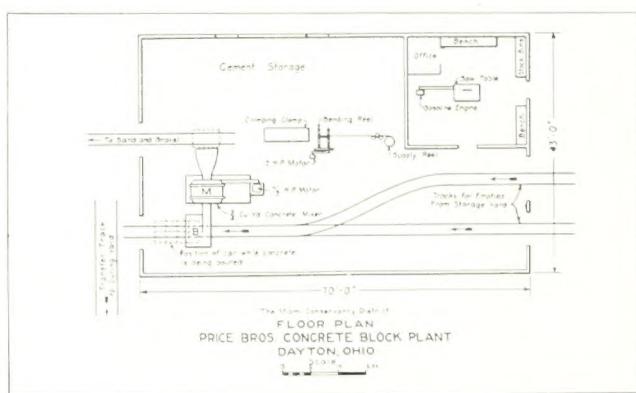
INTERIOR PLAN, CONCRETE BLOCK PLANT
